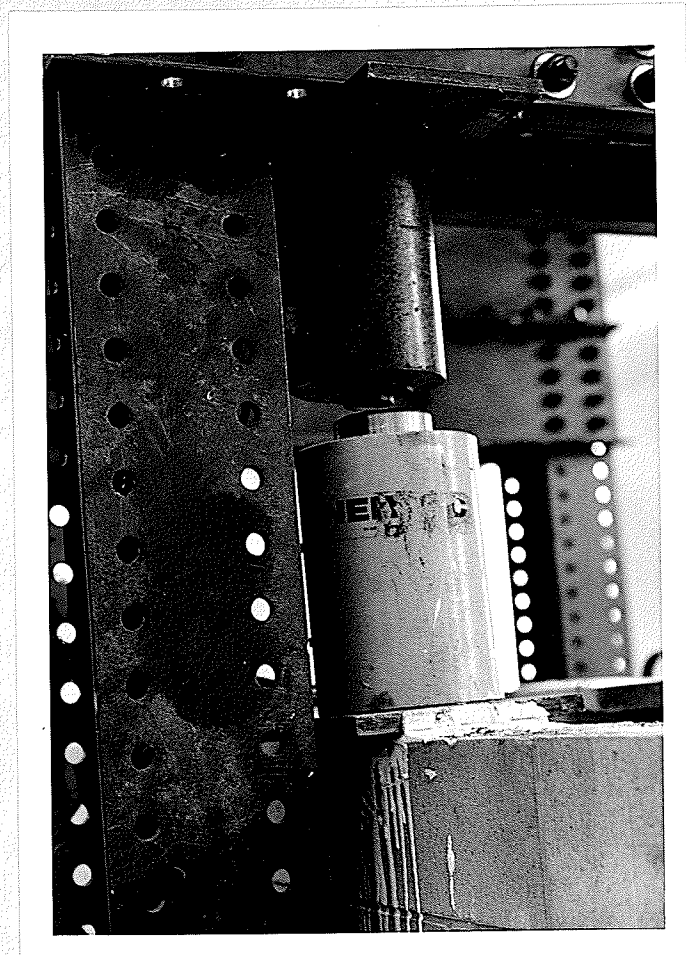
HYDRAULIC JACK AND LOAD CELL
